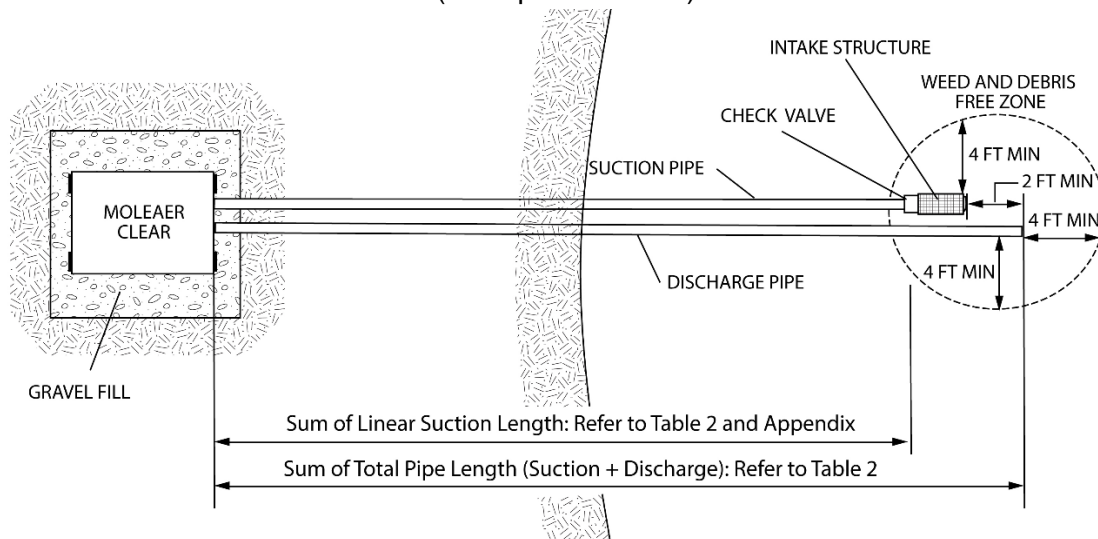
Plan View of Clear Suction and Discharge Pipe Installation
